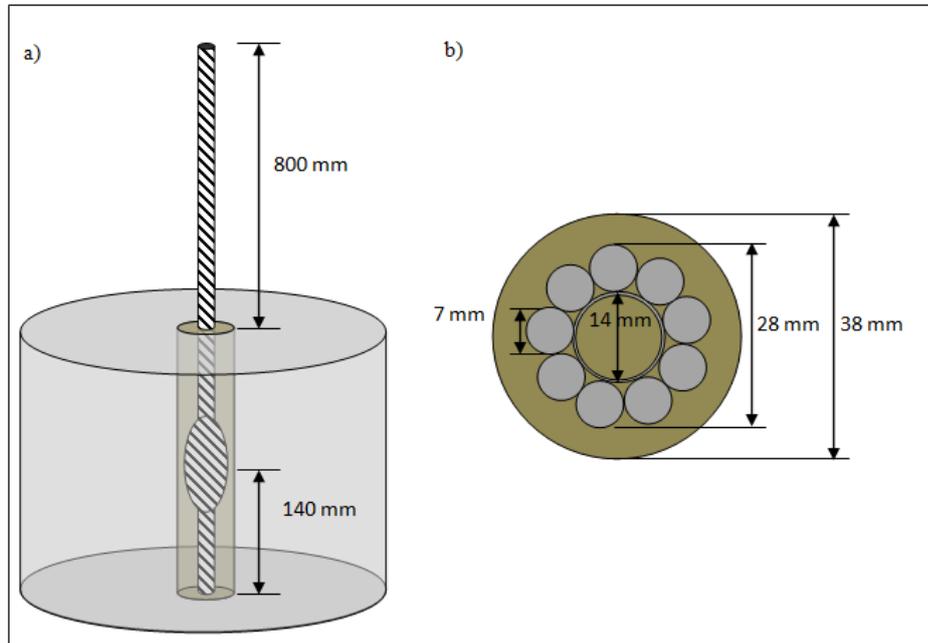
a) Schematic of cable bolt installation technique; b) Cross-section of resin column and cable bolt
